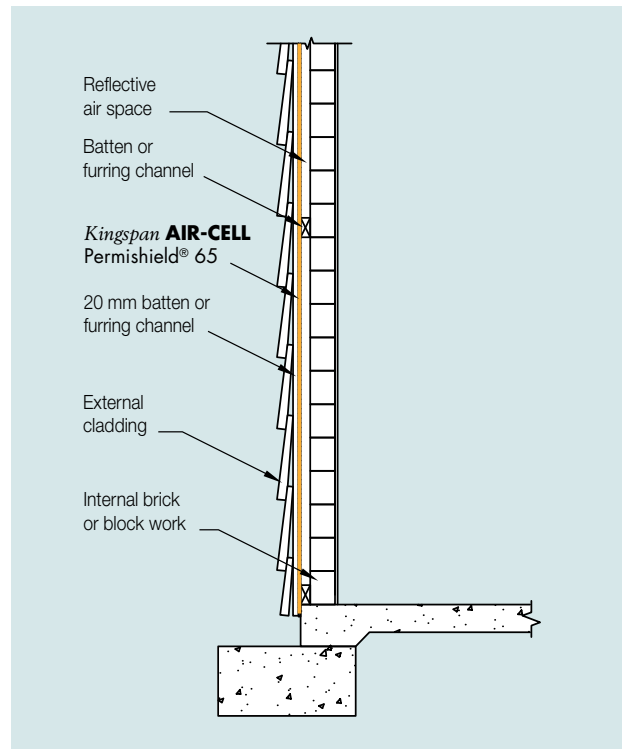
Side elevation of Kingspan AIR-CELL Permishield® 65 in a reverse brick veneer wall
